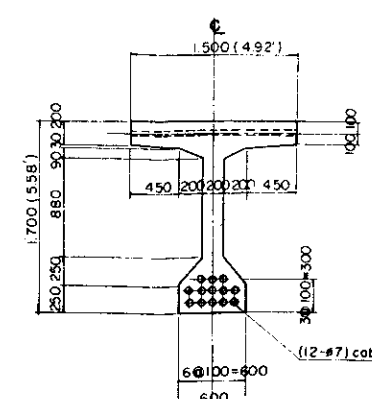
DETAIL SECTION OF OUTSIDE GIRDER Scale 1:30
